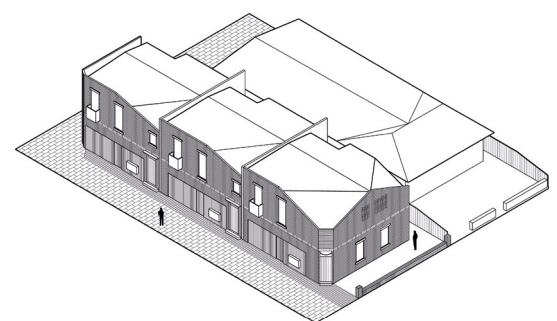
Note the plot to dwelling ratio of townhouses at 1 Davison Street compared to its neighbour, a detached dwelling at 3 Davison Street.
